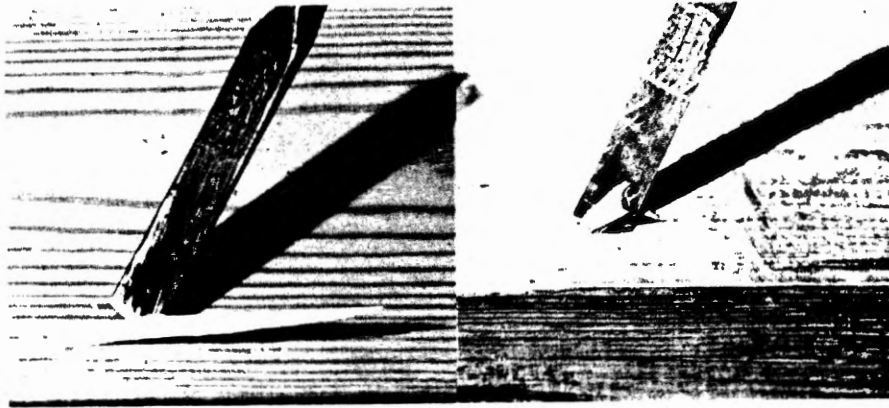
Use of "pick test" for control of short or abrupt fractures (soft rot)
